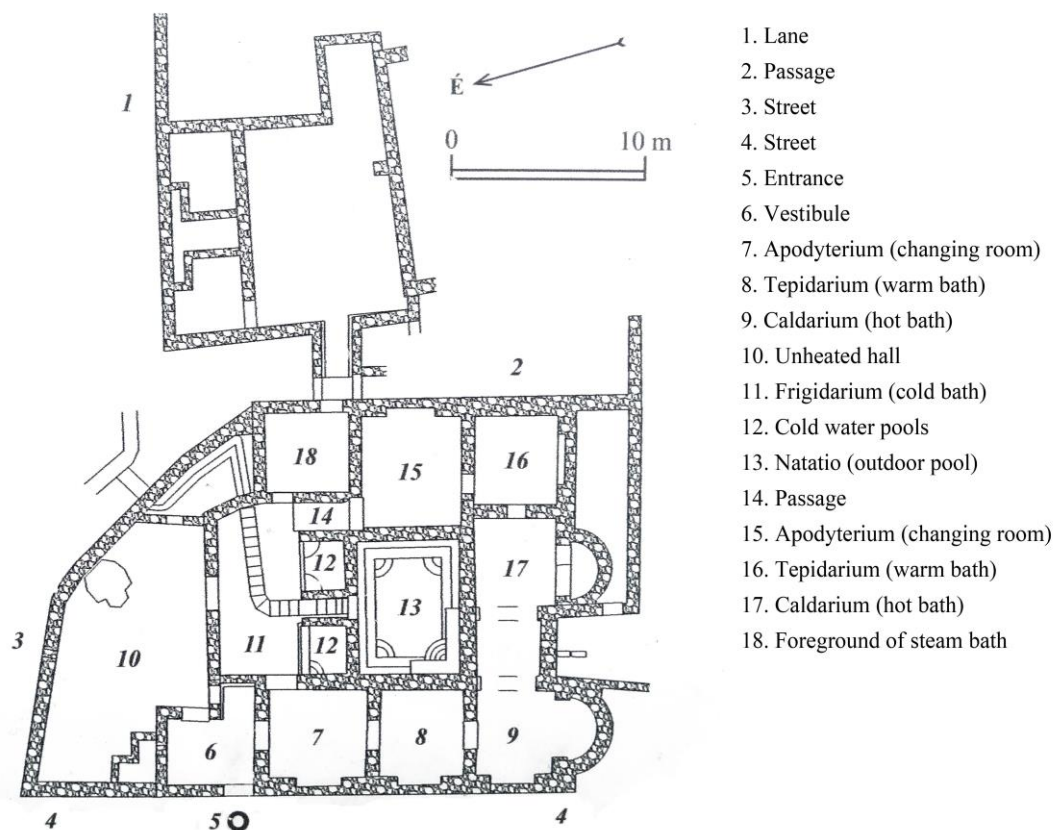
Layout drawing of the double bath (Aquincumi Múzeum)
